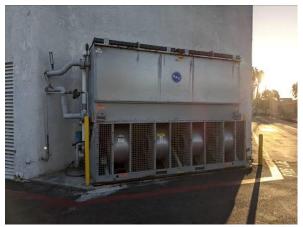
View of the cooling tower located on the southwest side of the 4952 Warner Avenue building.
